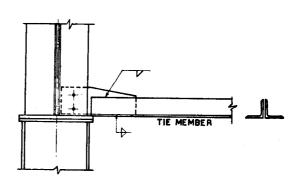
DETAIL T4 AT LEAN-TO ROOF END
